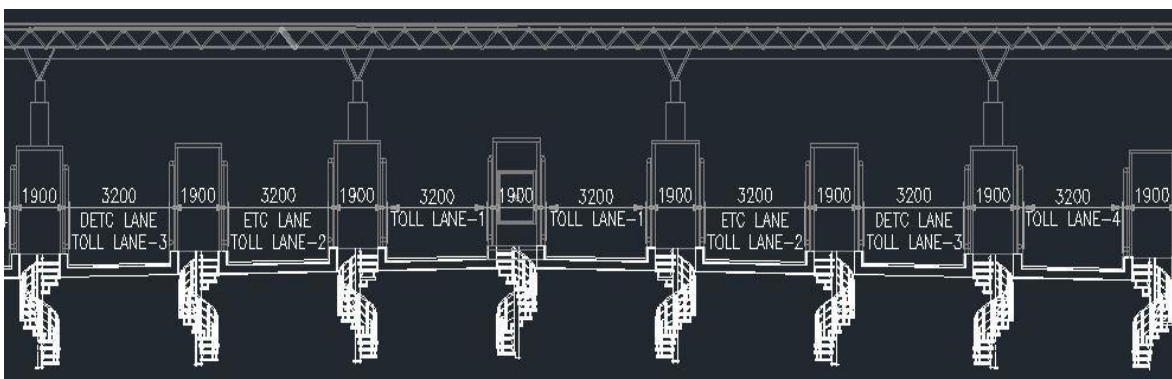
Typical elevation plan layout of Toll Island and lane
